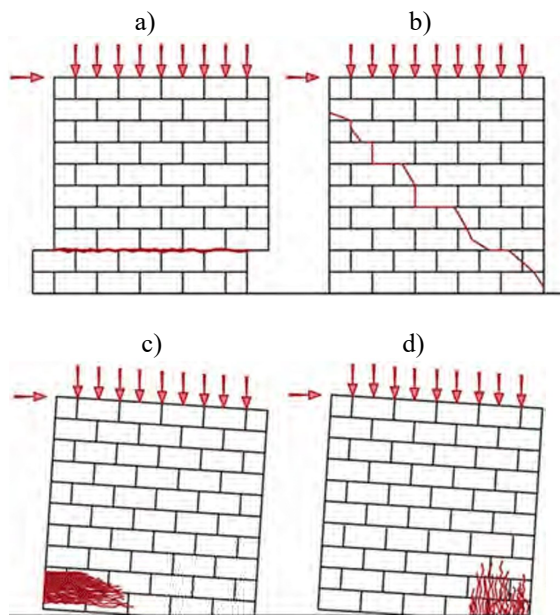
The nature of the destruction of masonry under the combined action of vertical and horizontal loads:
